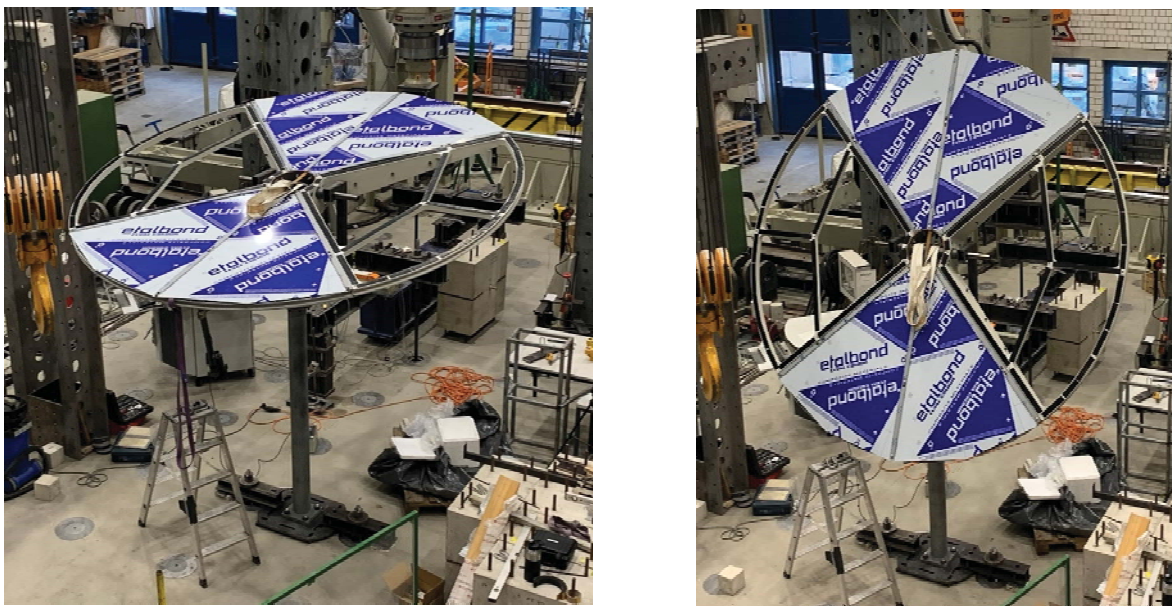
Test set-up of the concrete heliostat in the laboratory of TU Kaiserslautern, Germany
